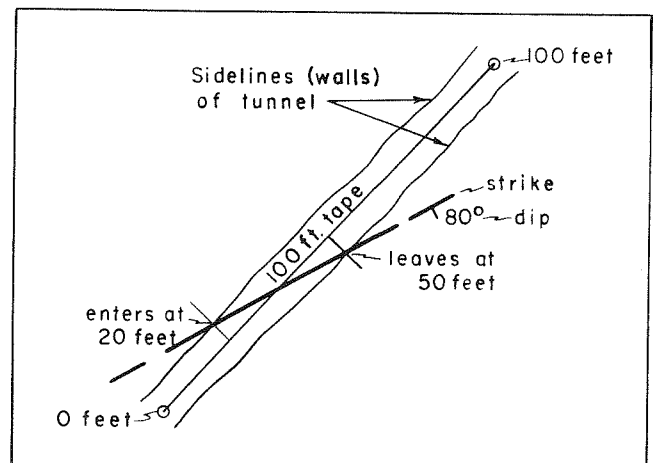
Plan showing one method of determining the strike of a structure (fault or bedding plane.)
